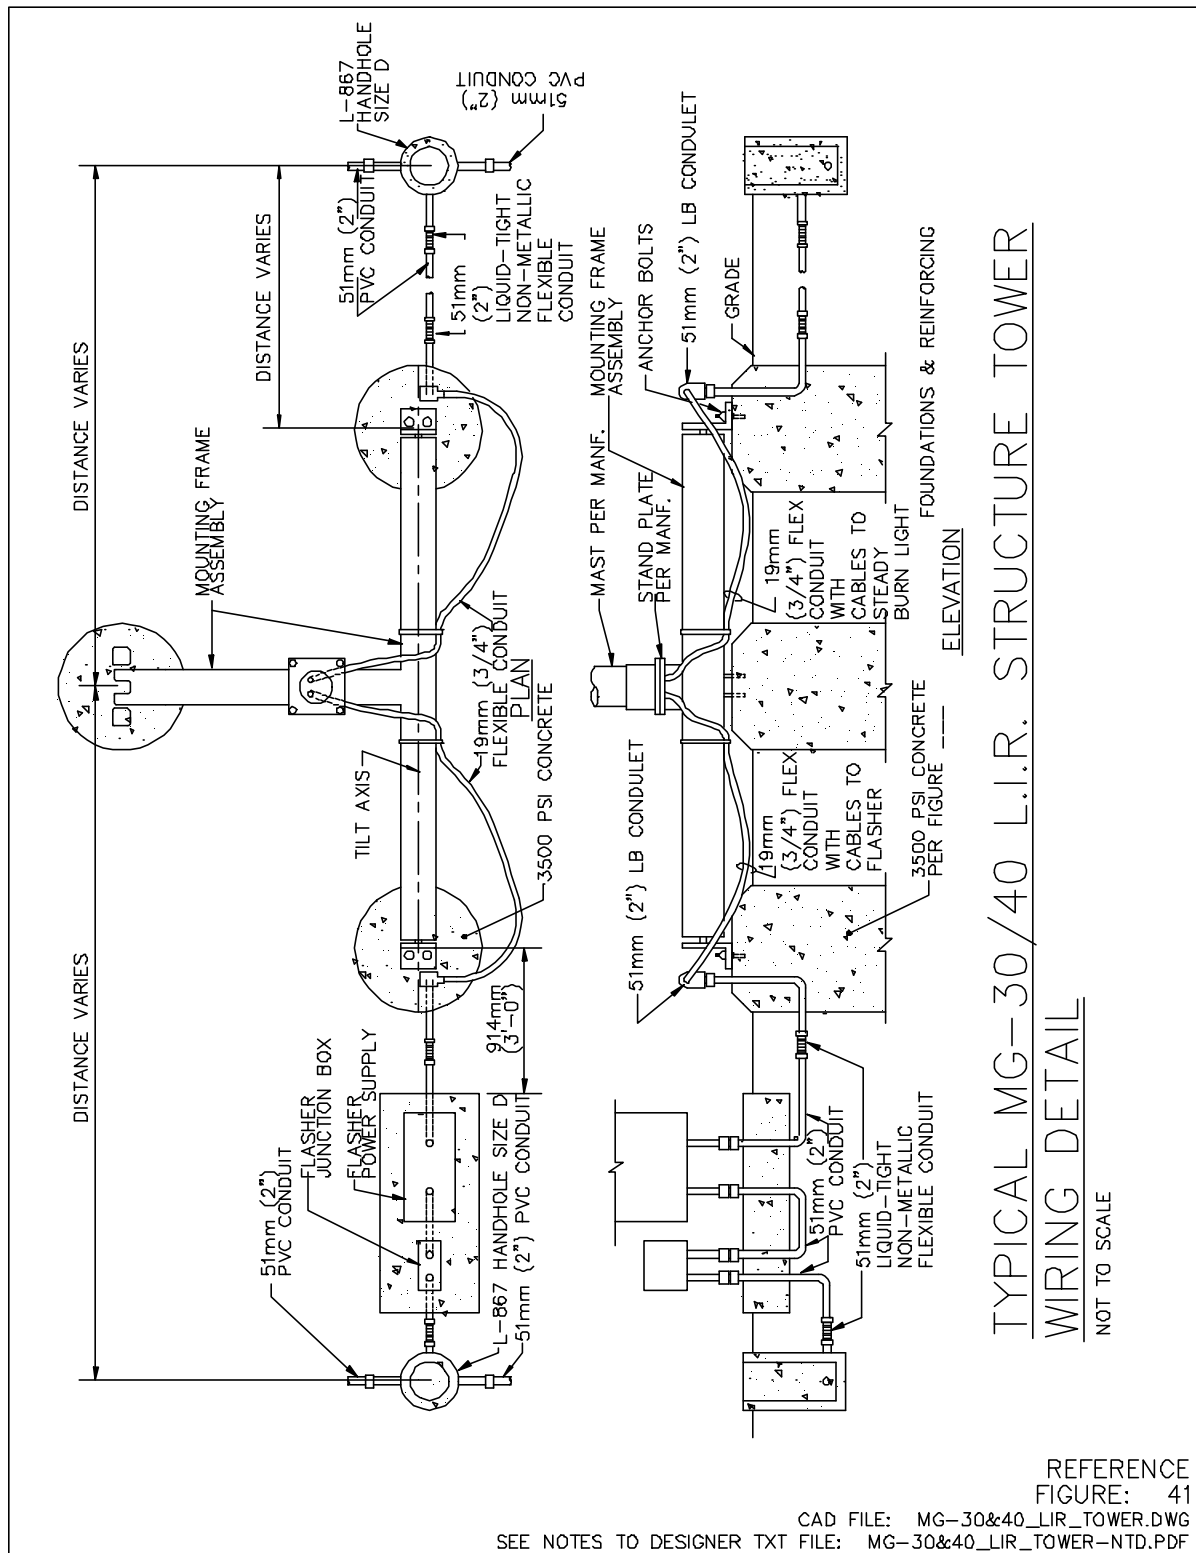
Typical MG-30/40 L.I.R. Structure Tower Wiring Detail
